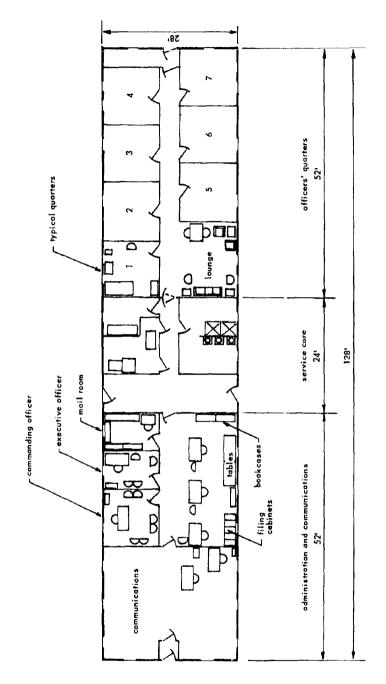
Building No. 5, administration and communications — quarters floorplan.
